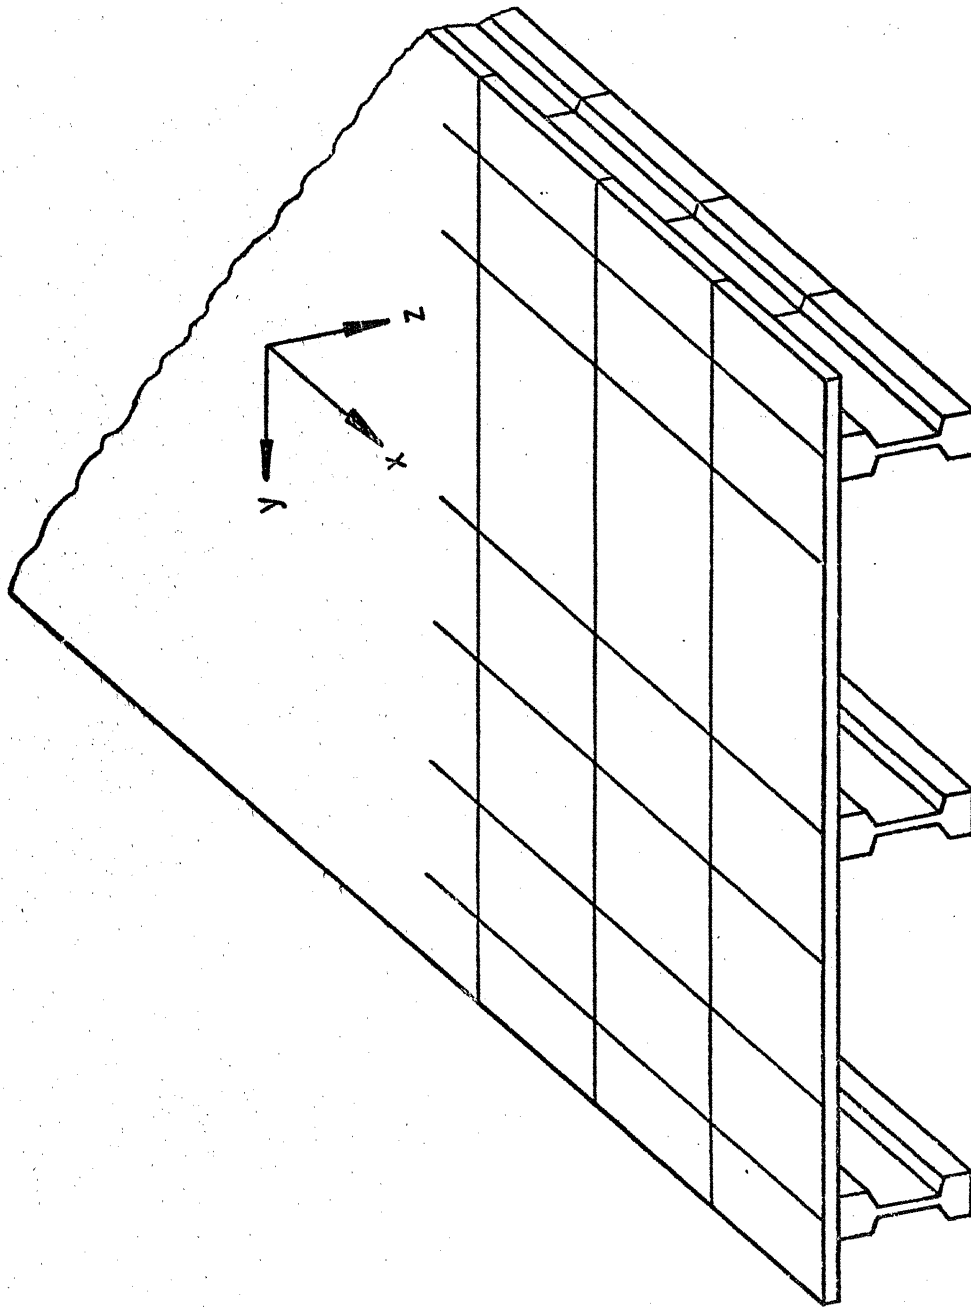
Typical Beam-Slab Type Bridge and Its Idealization by Beam and Slab Finite Elements.
